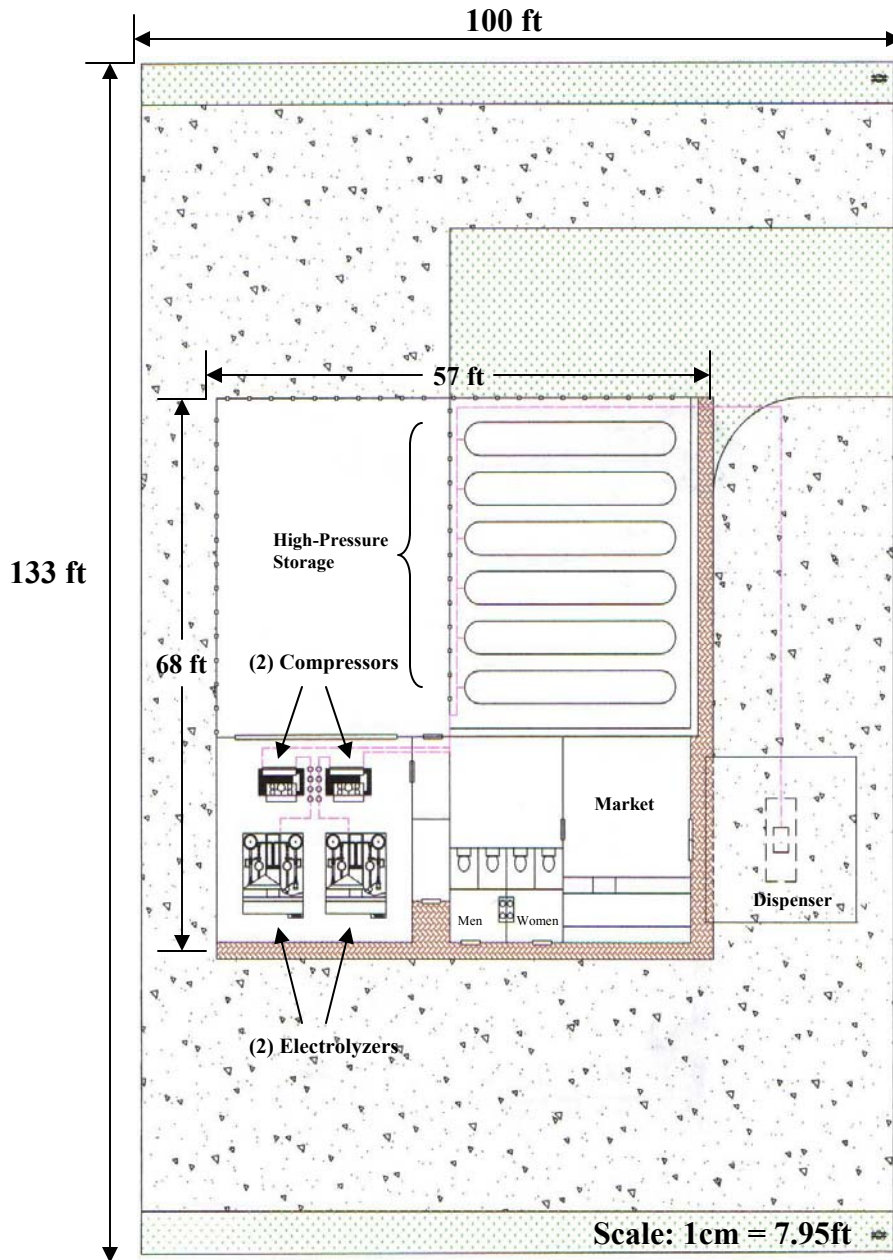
A plan-view schematic of the fueling station site (Adame, 2004).
